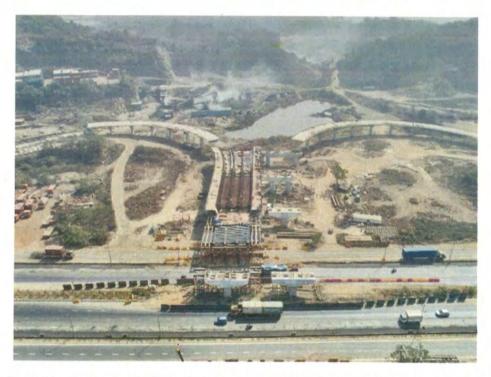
A view of MTHL Bridge - MJP & PMP Ramps at Chirle Interchange
